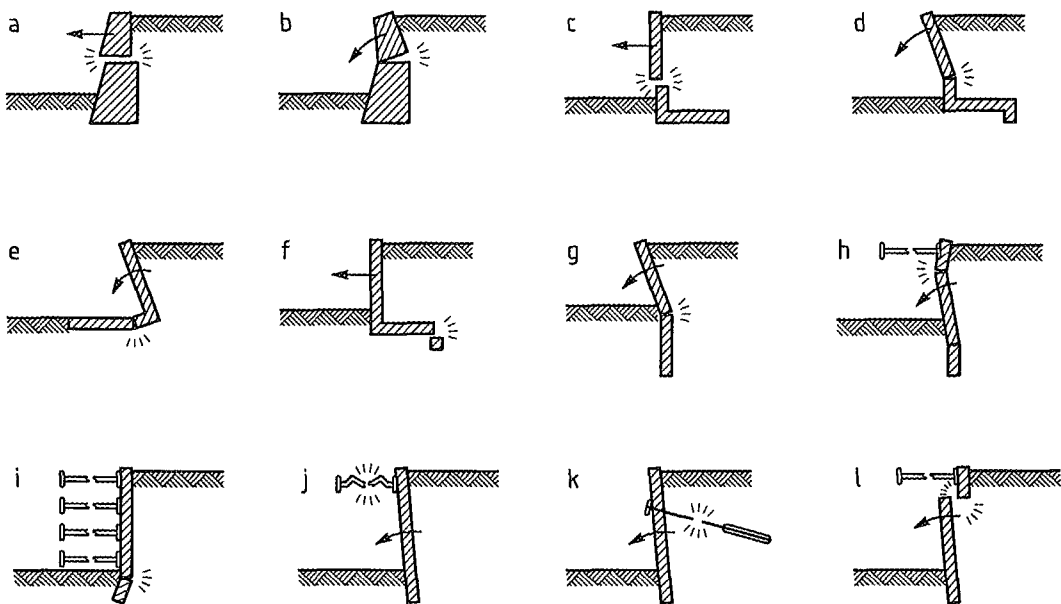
Examples of limit modes for structural failure of retaining structures (from Eurocode 7)
